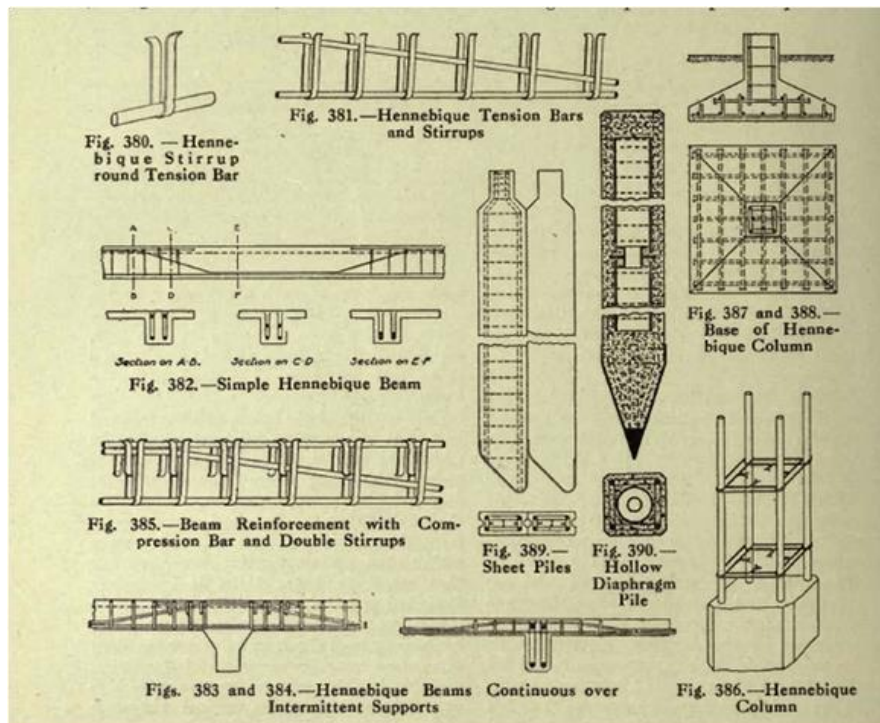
4. Concrete-Steel Rod Detailing, Hannebique System (1892)
